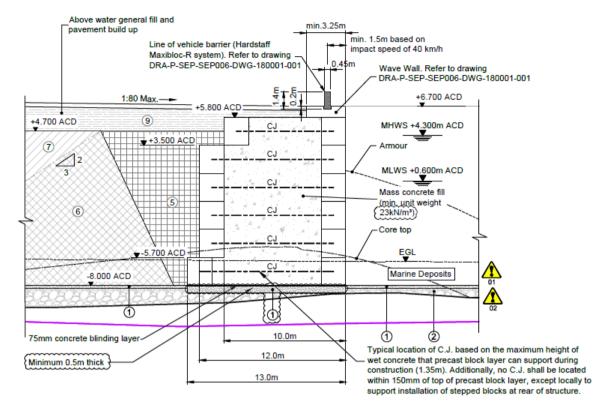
Transition Structure at North breakwater showing Construction Joints
